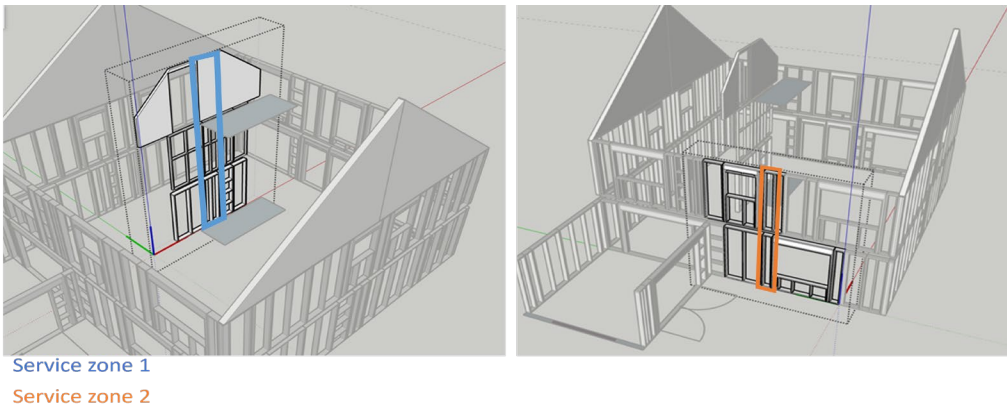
Vertical service zones shown in the building. (All other internal walls and floor cassettes are not shown.)
